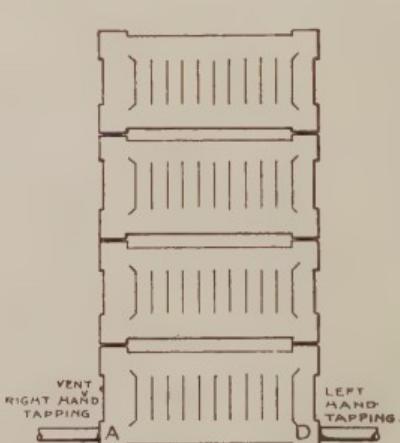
Assembled Four Horizontal Sections in Four Tiers One and Two-pipe Steam
